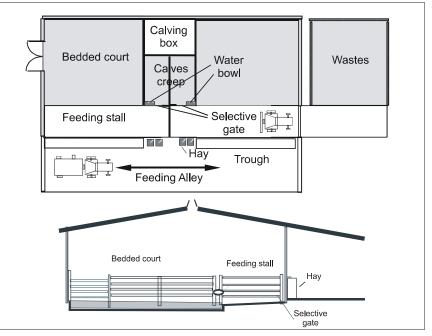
Layout and cross section from a bedded house with a concrete exercise court and calves creeps between cow pens
